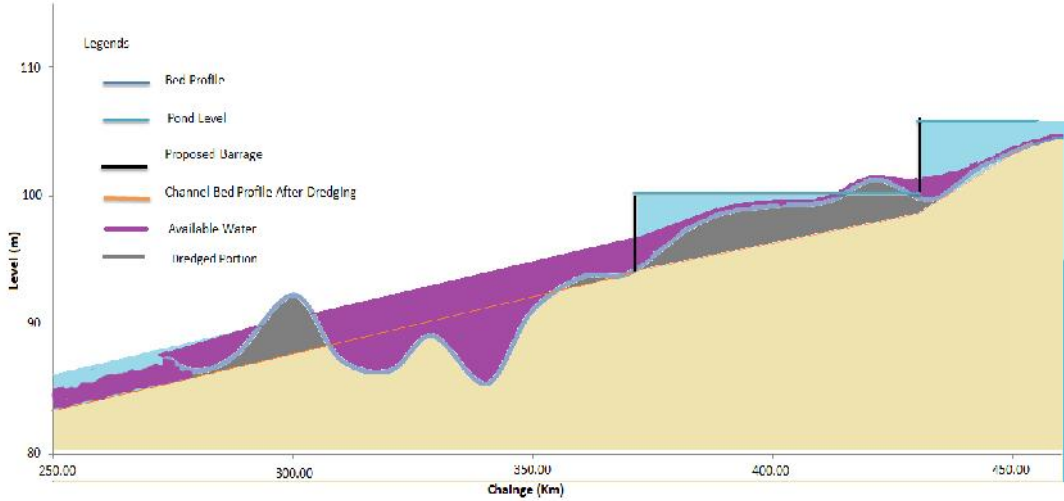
Barrage Location for Stretch-2 (Ch. 272 km to Ch. 453 km)
